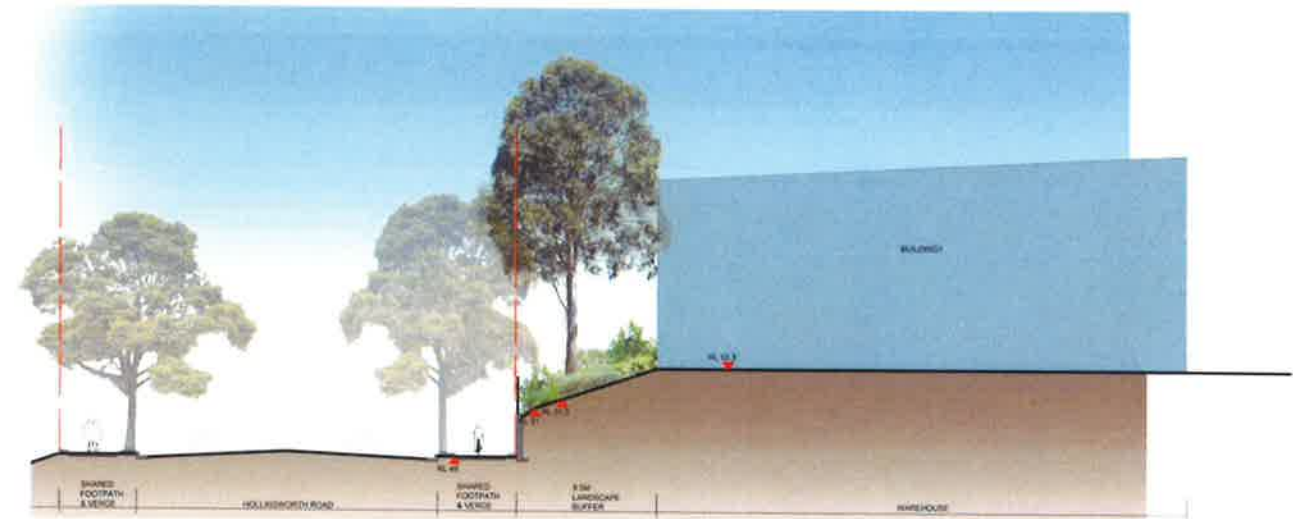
SECTION THROUGH THE HOLLINSWORTH ROAD BUFFER (BUILDING 1)
